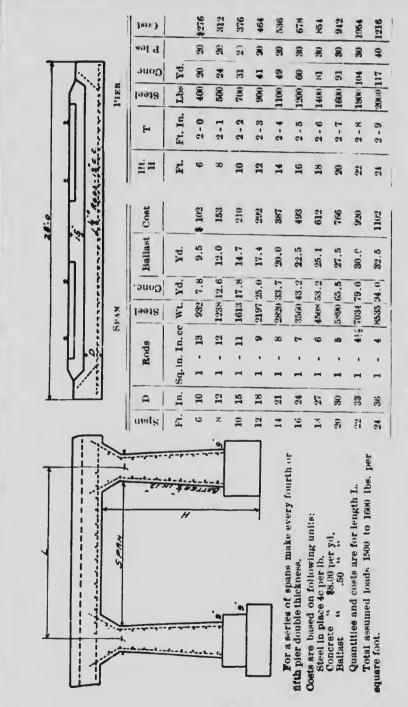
Design D. DOUBLE TRACK CONCRETE TRESTLES. BEAM REINFORCEMENT, Fig. 61. Design D. DOUBLE TRACK CONCRETE TRESTLES. BEAM REINFORCEMENT.
